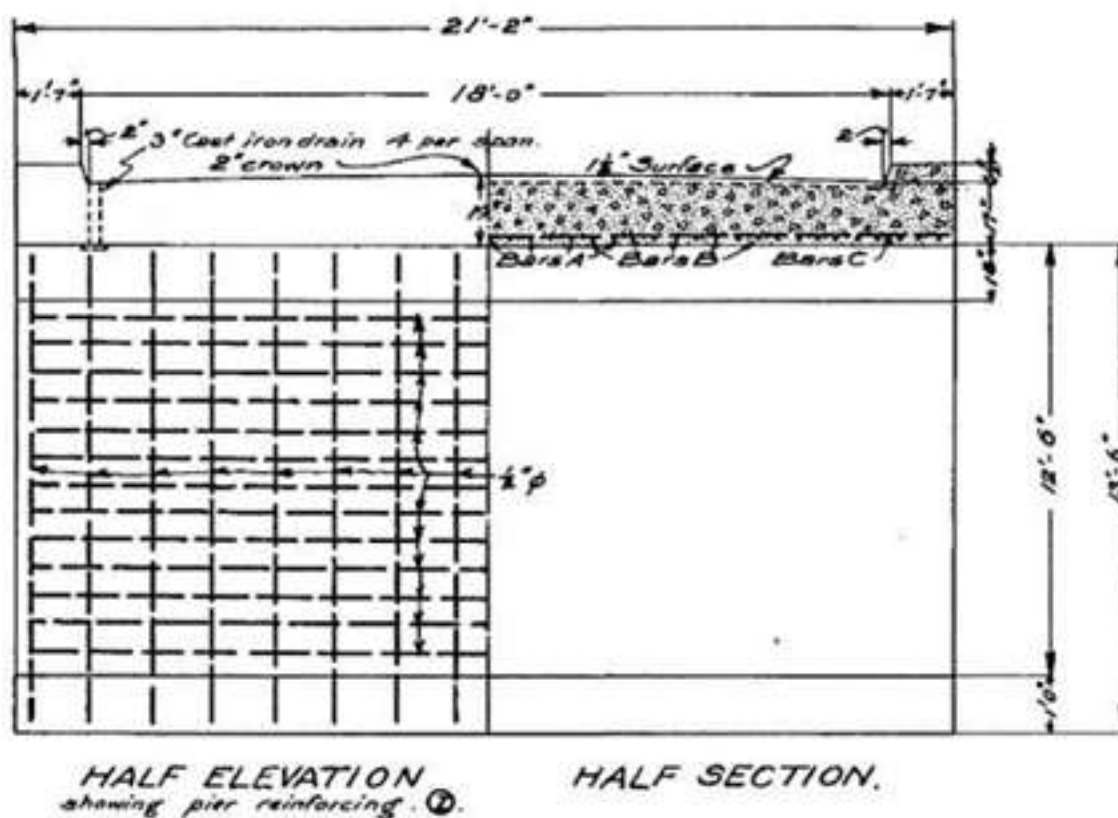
1924 Drawings of Roadway Section of Two-Span Continuous Bridge in Fayette Co. from SHDA (1924)
